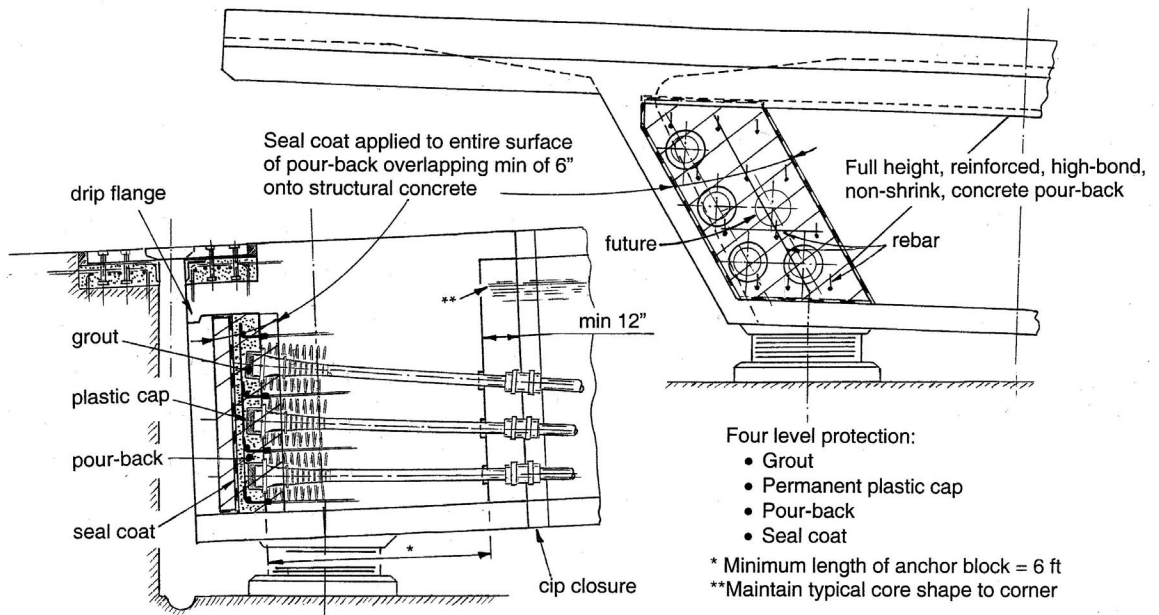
Protection of a group of anchors at an expansion joint segment.
